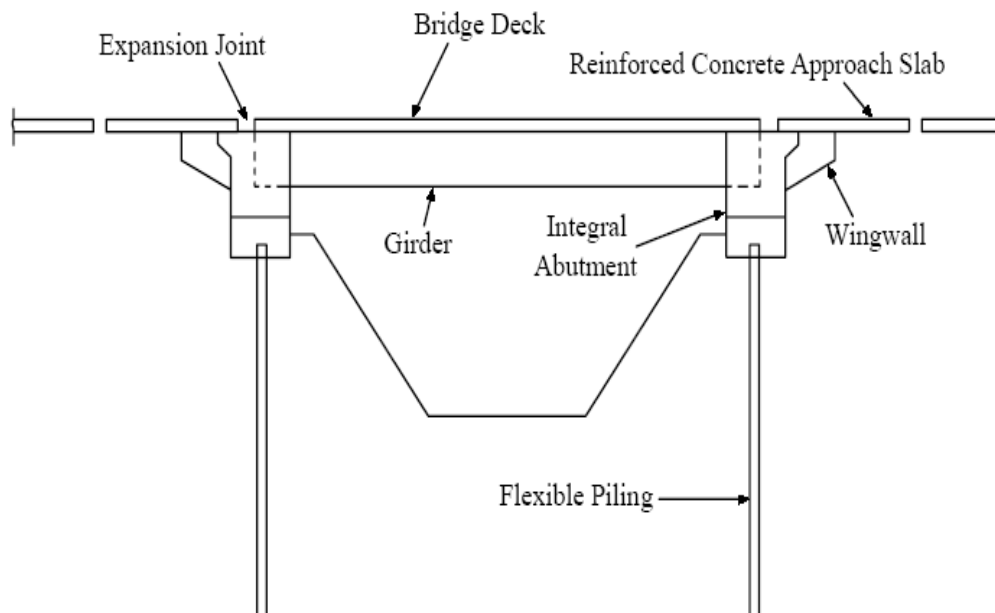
A Simplified Cross Section of an Integral Abutment Bridge
